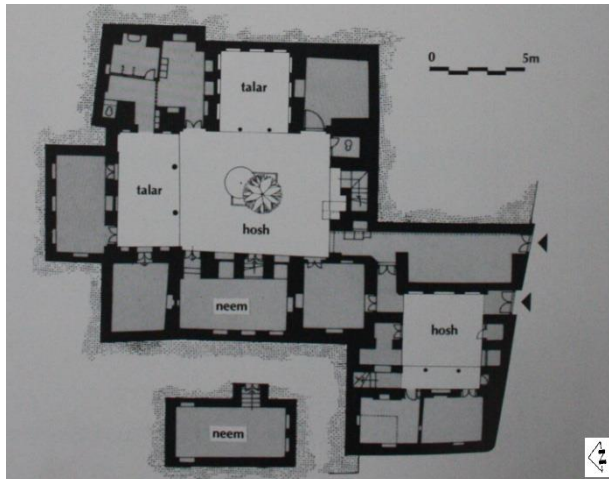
House 47 (ground Floor Plan) Baghdad (Warren & Fethi 1982)
